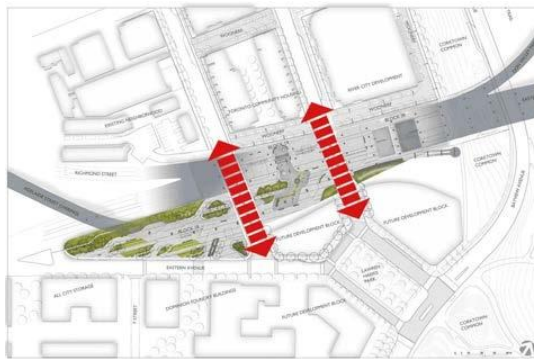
(left) Underpass Park (Image source: author's redrawing)
